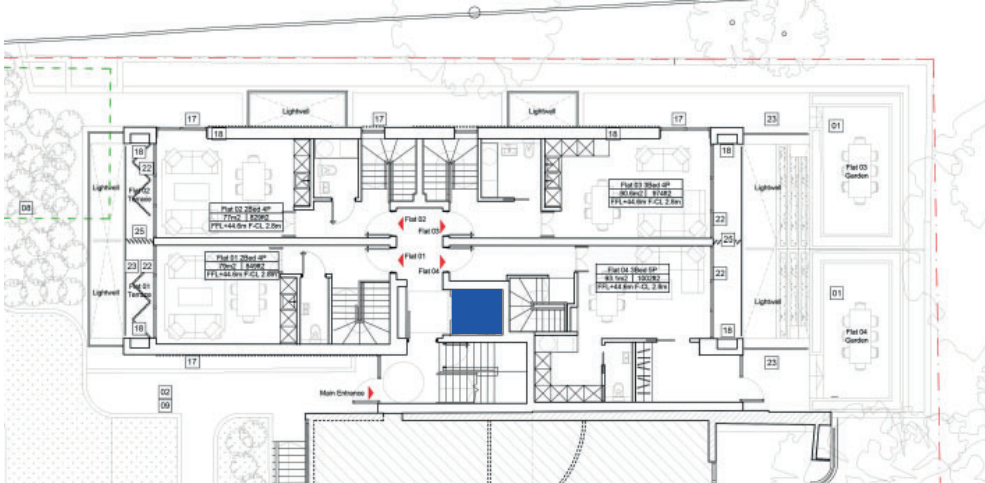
PROPOSED _ Lift position - Ground floor plan
